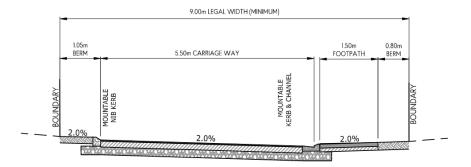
Typical JOAL Cross-Section (1) - 9.0m Minimum with Footpath
